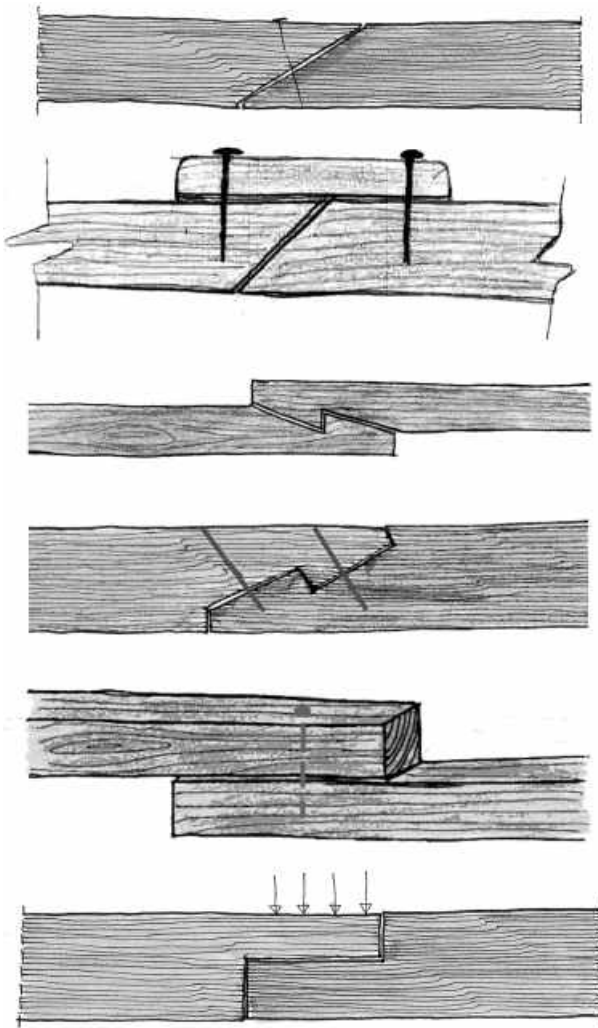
Typical splices of longitudinal timber elements (Vintzileou, 2008)
